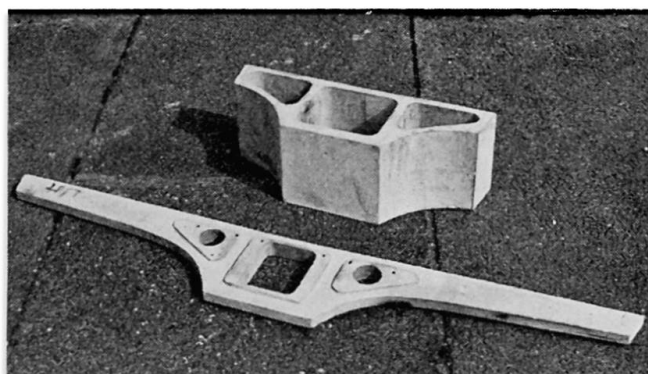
Hammersmith Flyover — Basic units used in construction of model.
